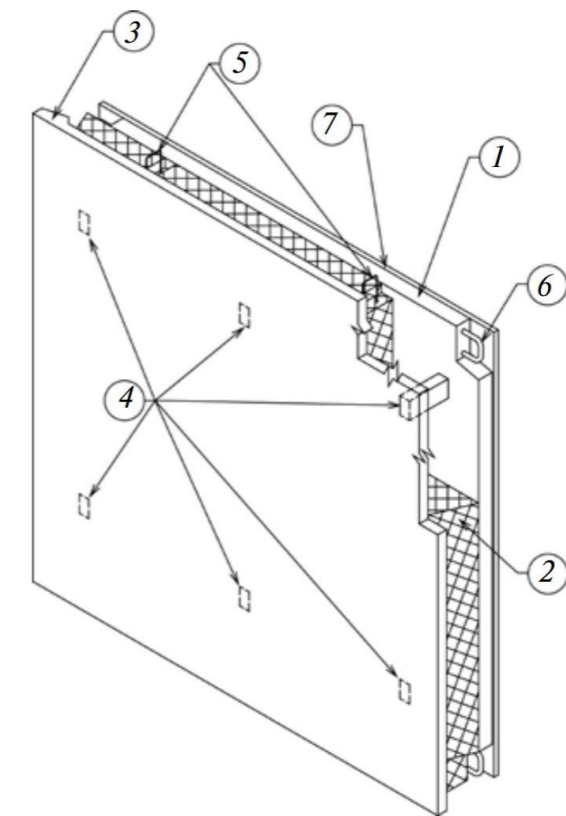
(on the left): the typical wall of the building type 112: 1 – inner reinforced concrete panel, 2 – polystyrene foam insulation, 3 – outside reinforced concrete panel, 4 – connections from reinforced concrete; 5 – metal loops; 6 – metal connectors.
